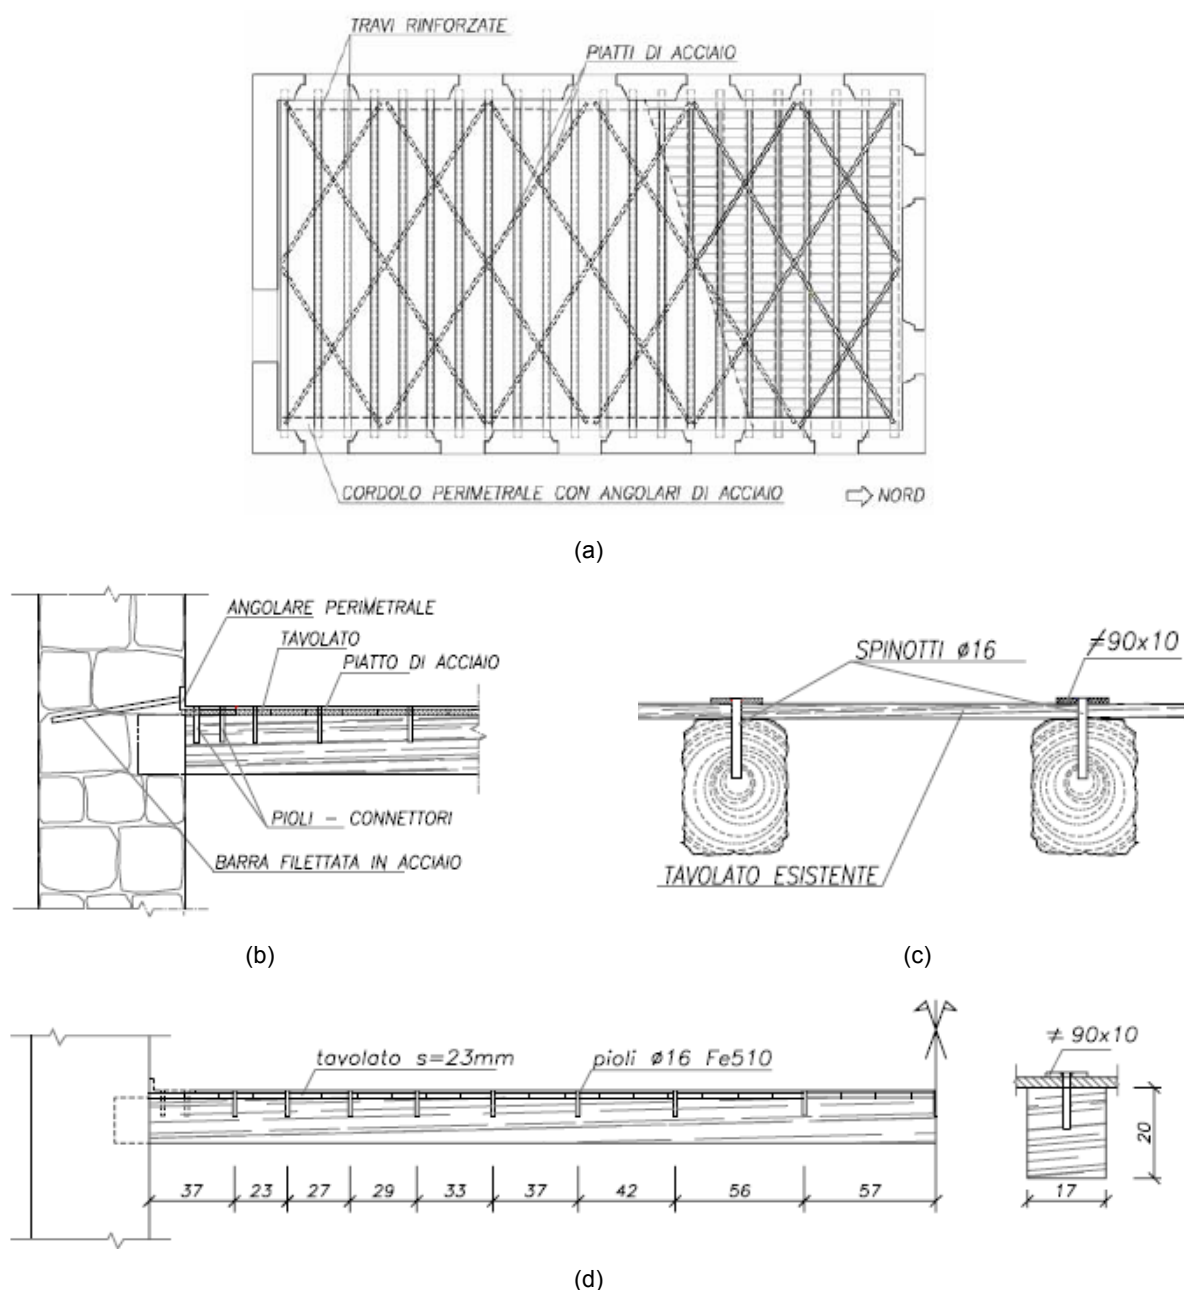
Intervention using metallic plates and diagonals, (Gattesco et al., 2007). (a) Technical prospect of the reinforcement. (b) Detail of the anchorage to the wall. (c) Transversal section. (d) Pins distribution along a main beam and correspondent transversal section.
